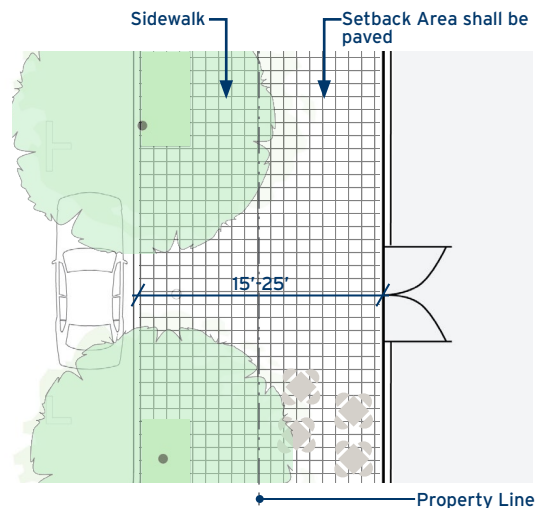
Shopfronts in Mixed-Use Buildings Conceptual Plan
